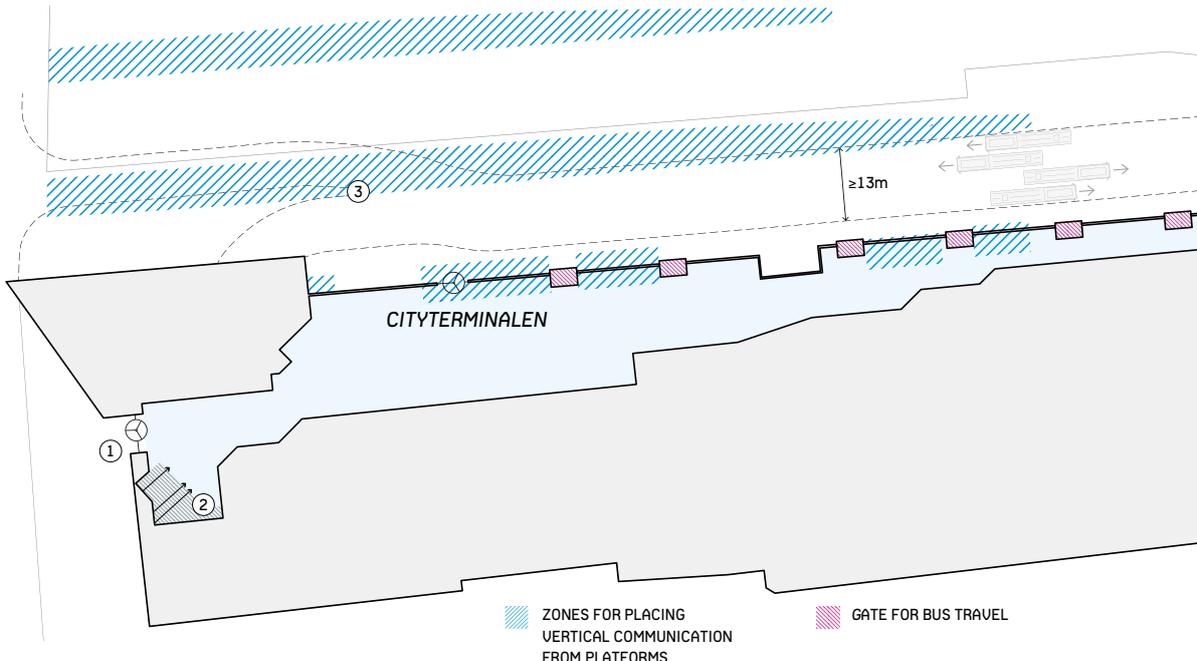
Plan section of Terminalslingan and Cityterminalen, 1. Entrance from Klarabergsviadukten, 2. Connection to Stockholm Central Station 3. Bus ramp- future layout under investigation
